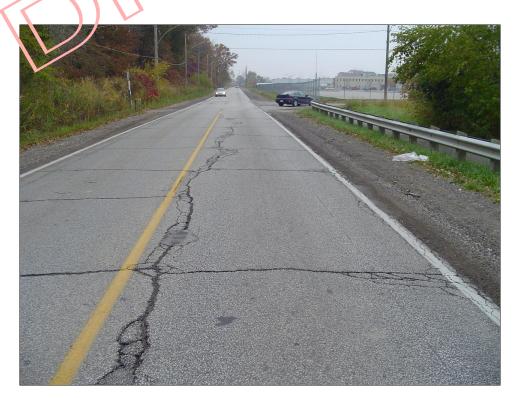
Malden Road - north of E.C. Row Expressway - looking south
